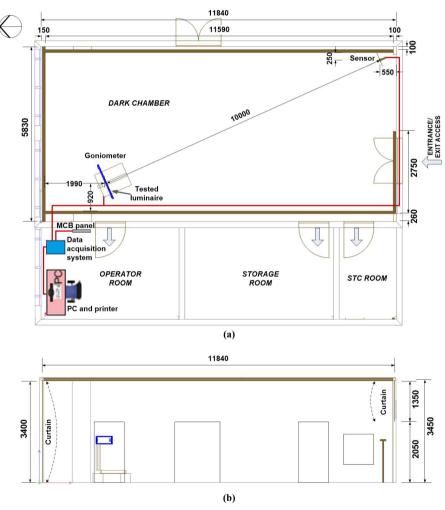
(a) Floor plan and (b) section plan of the dark chamber
